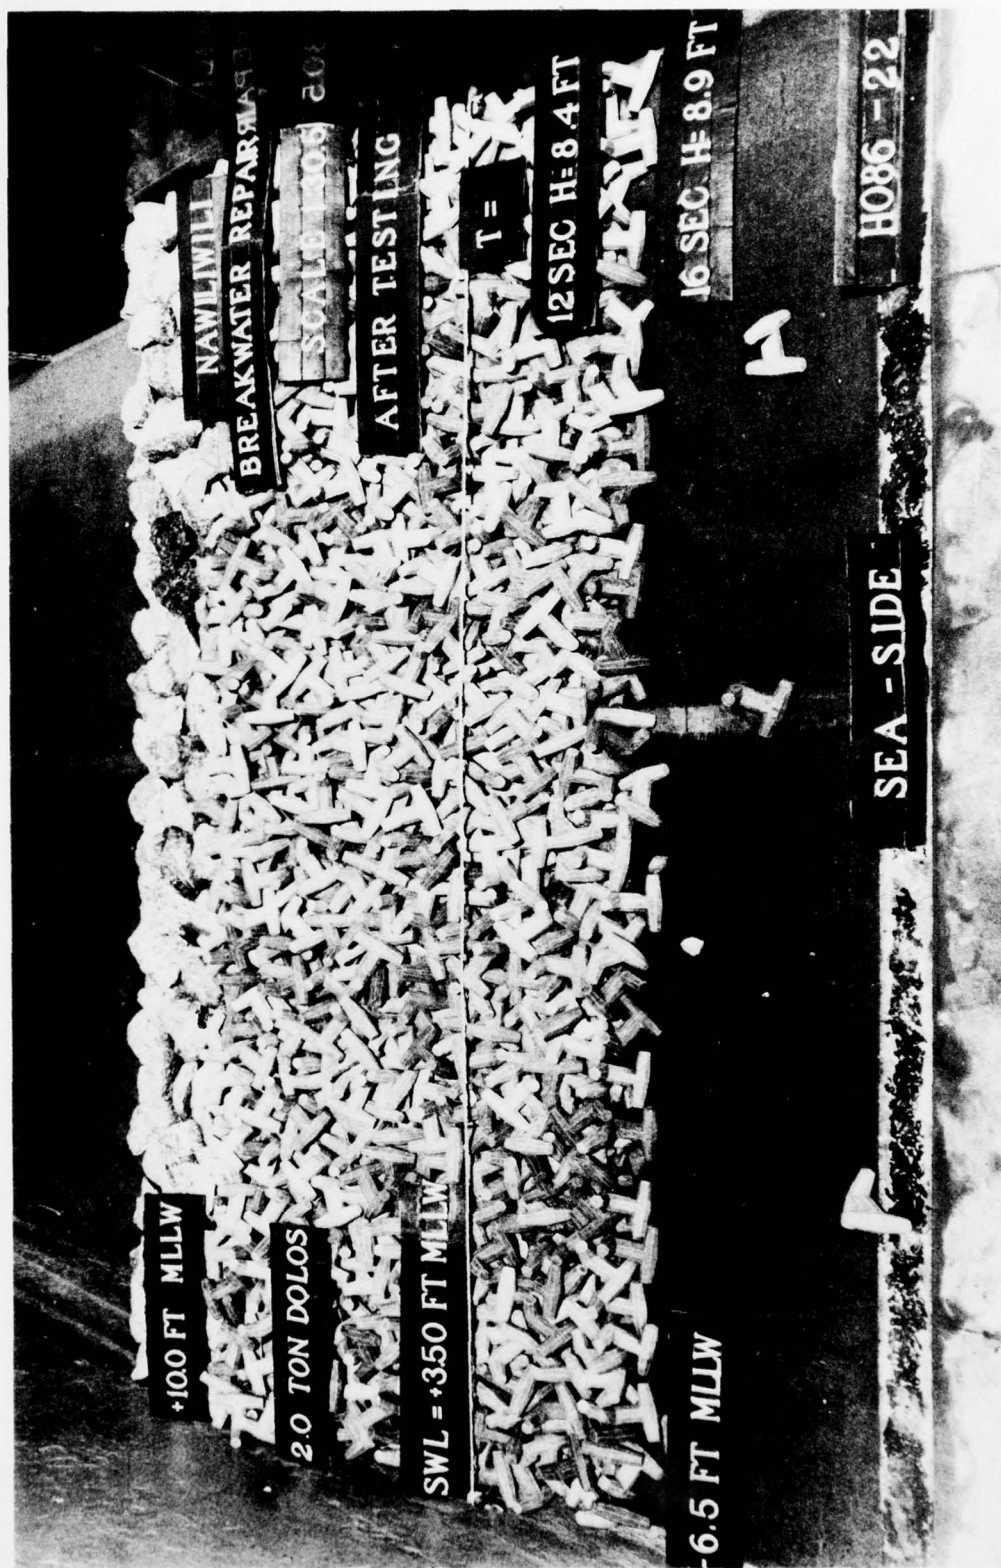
Sea-side view of test section 3 after testing with 12-sec, 8.4-ft and 16-sec, 8.9-ft waves at the +3.5 ft mllw swl
